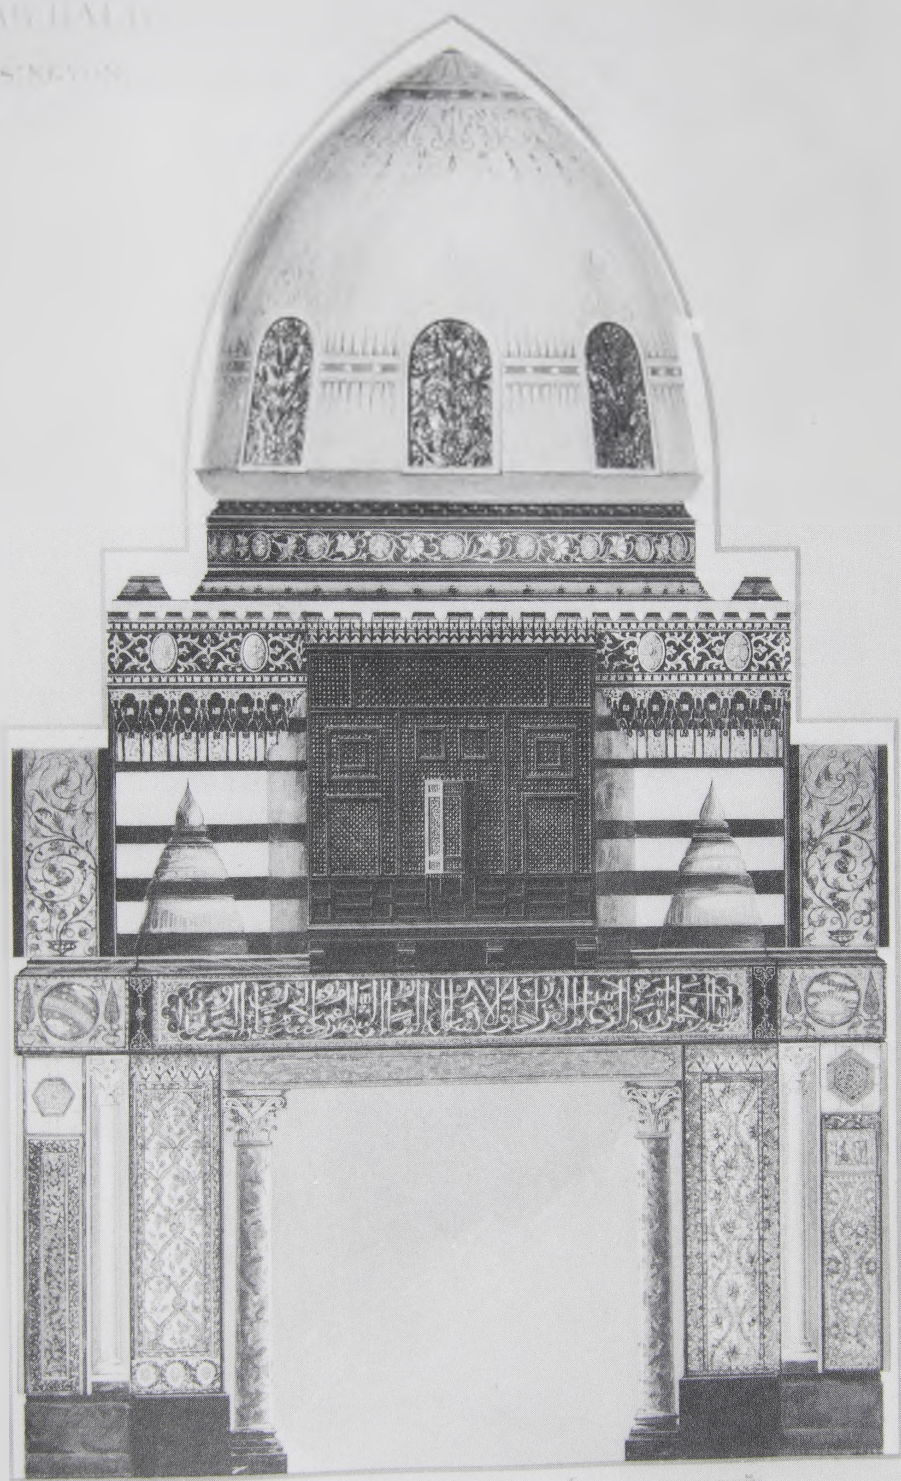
George Aitchison. London, Holland Park Road, Leighton House: Design for a wall elevation in the Arab Hall, 1880
